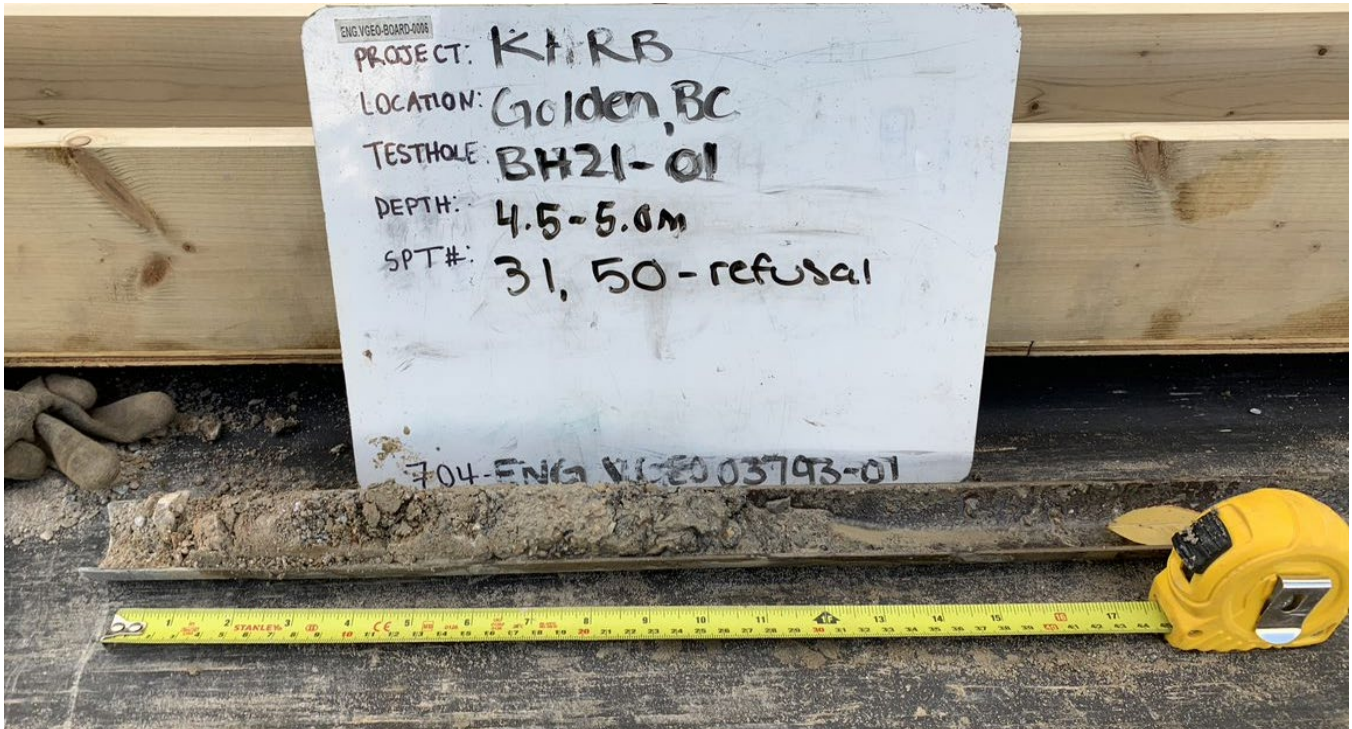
BH21-01, SPT-02, 4.5 m to 5.0 m
